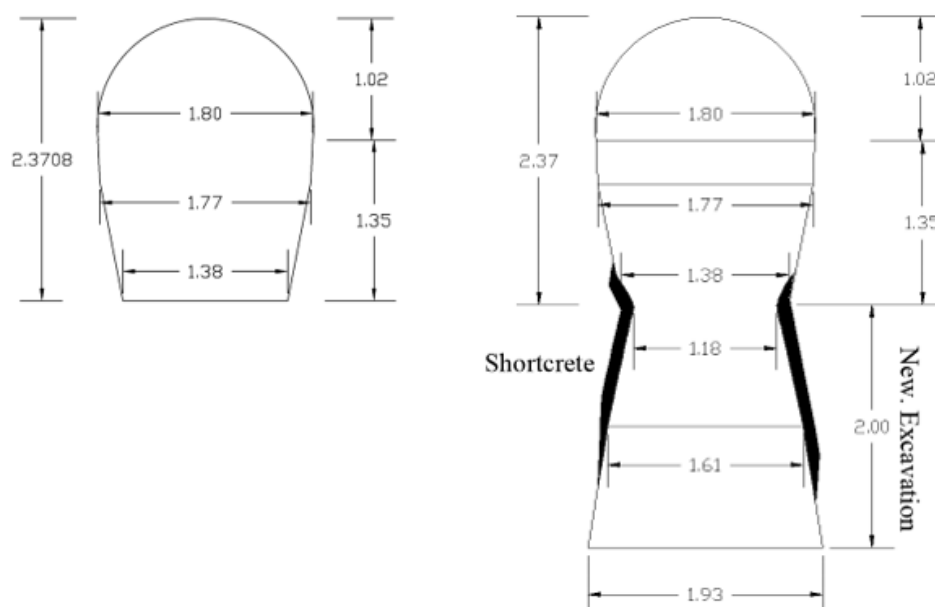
Existing tailrace tunnel cross section before enlargement (left) and after enlargement (right)
